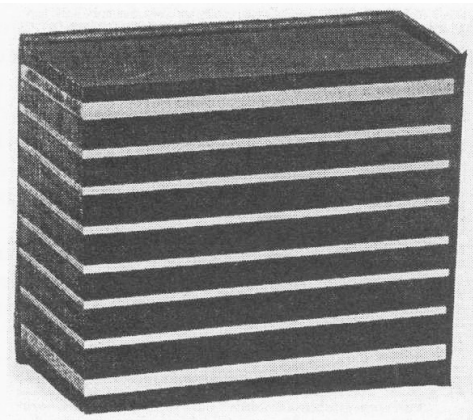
Section cut from a bridge bearing showing steel plates adhered to black rubber [256]
